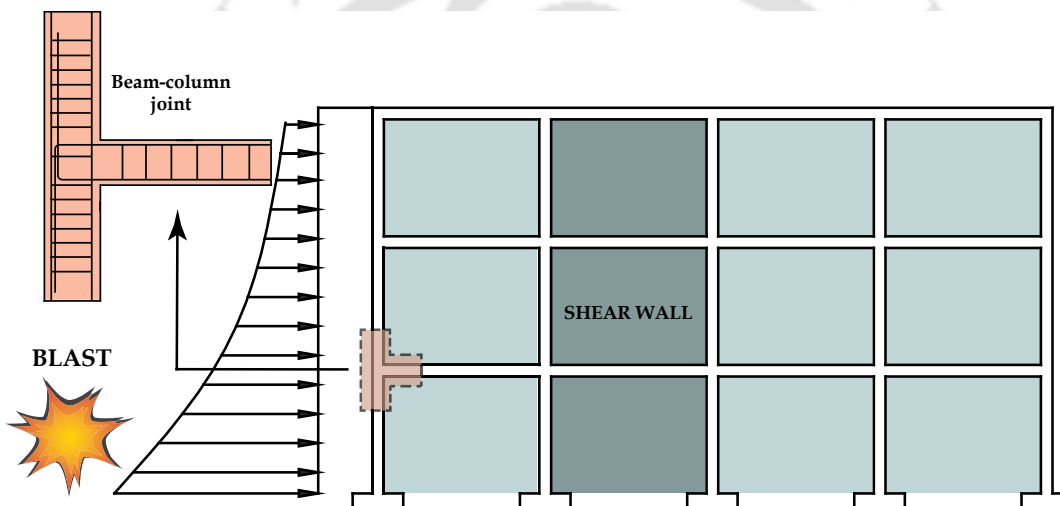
Ductile detailing of connection in reinforced concrete structure; note the dense reinforcing in the vicinity of the connection (adopted from FEMA-426 2003)
